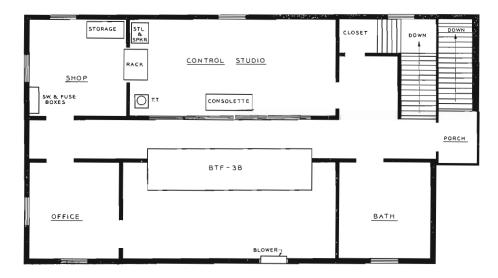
Floor plan of the WRZE transmitter building showing location of the FM transmitter and control equipment.
